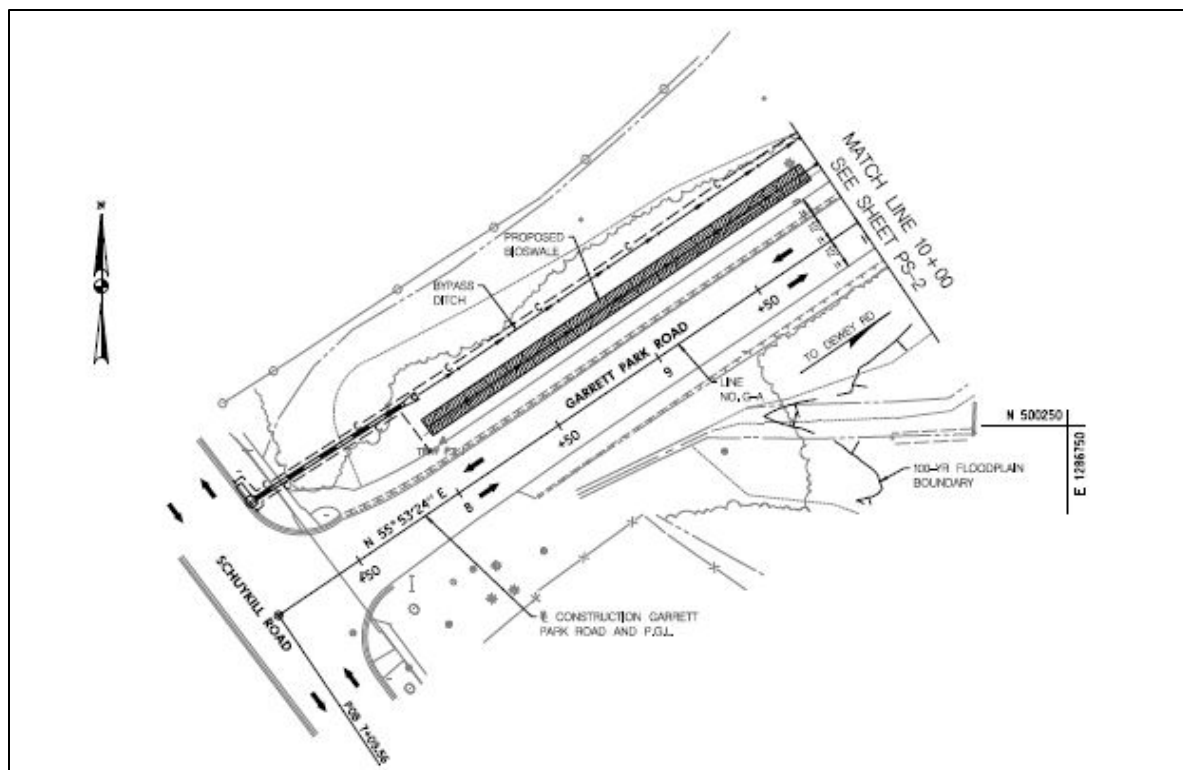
Plan View of Proposed Design Improvements (Part 1)
